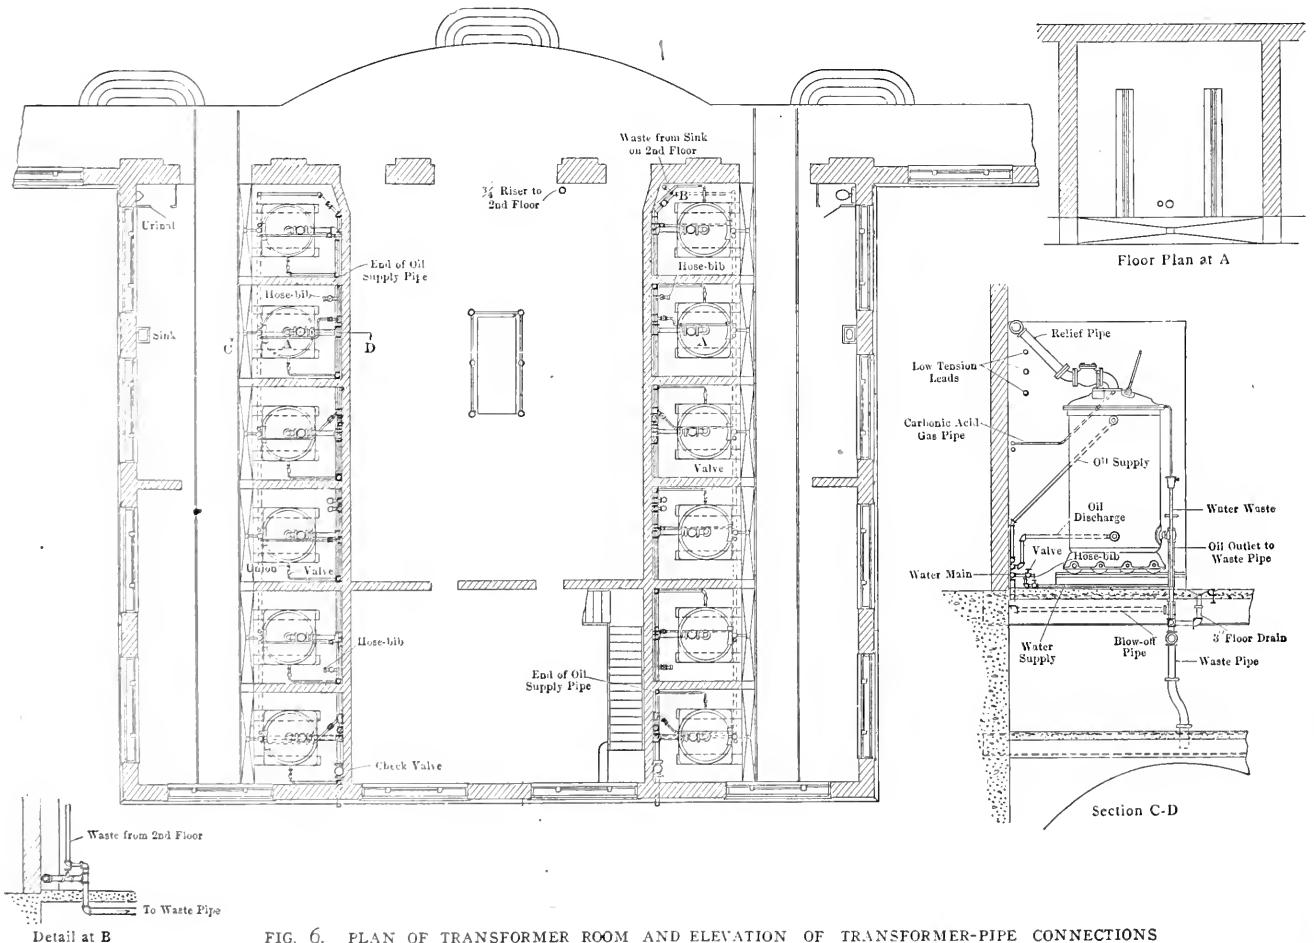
PLAN OF TRANSFORMER ROOM AND ELEVATION OF TRANSFORMER-PIPE CONNECTIONS
